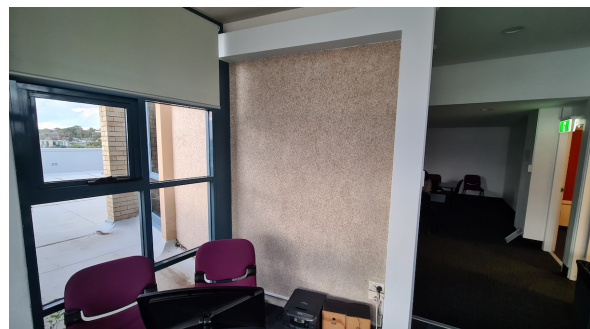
External wall of the former chapel with crushed white marble terrazzo wall finish.
